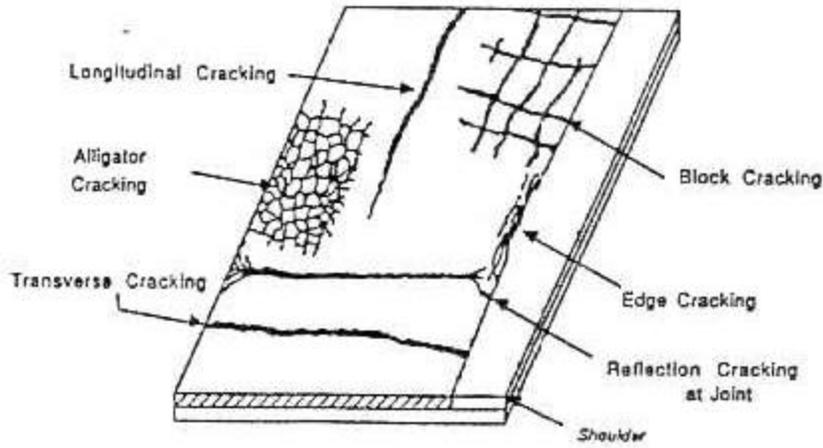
Sketches of Typical Distresses on Flexible Pavements.
